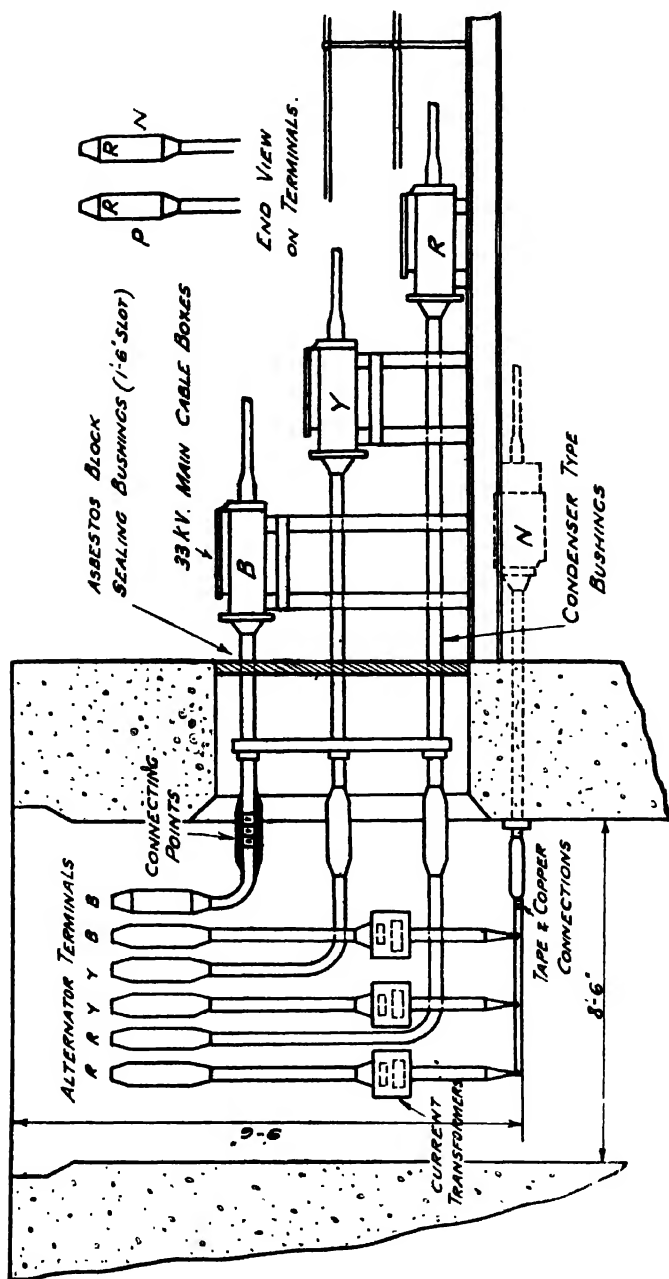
Alternator Main Connections with Condenser Type Bushings.
